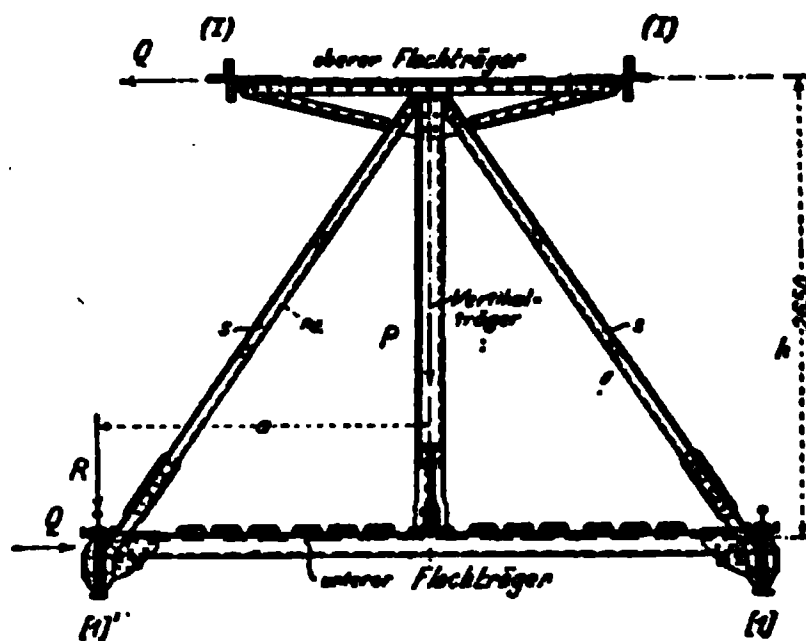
Transverse Frames, Suspending Floor and Running Rails of Track-girder.
